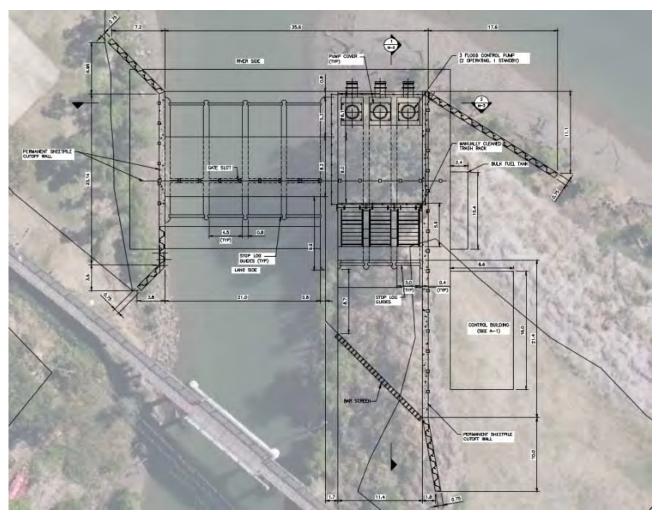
Location of Proposed Levee near the Saltwater Creek Bridge
